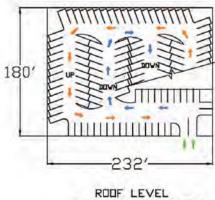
ETSU Master Plan / Structured Parking Site 4 Concepts
